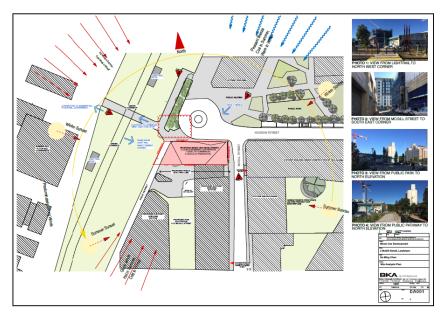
Extract from the Site Analysis Plan prepared by Baker Kavanagh Architecture, demonstrating consistency with the Masterplan and relationship with the development proposed at Nos. 4-12 McGill Street to the south
